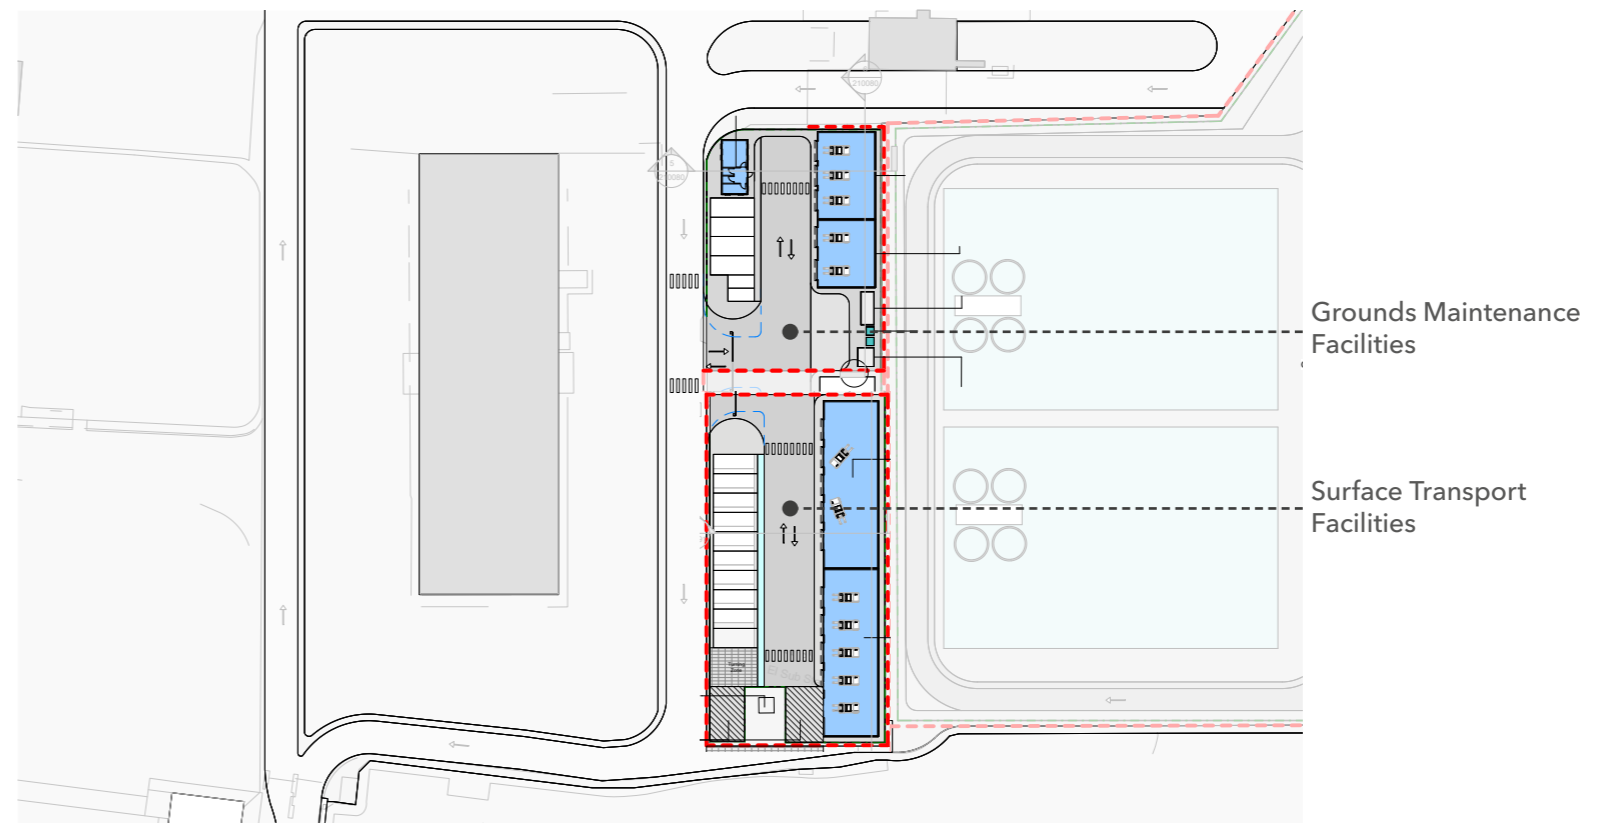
Indicative Site Plan - Airfield Surface Transport Facilities
